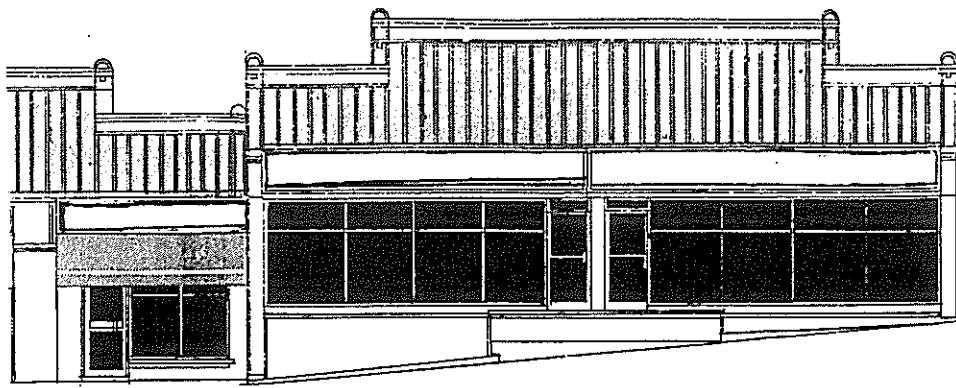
Street wall heights should be increased to 1 1/2 storey heights where possible.
